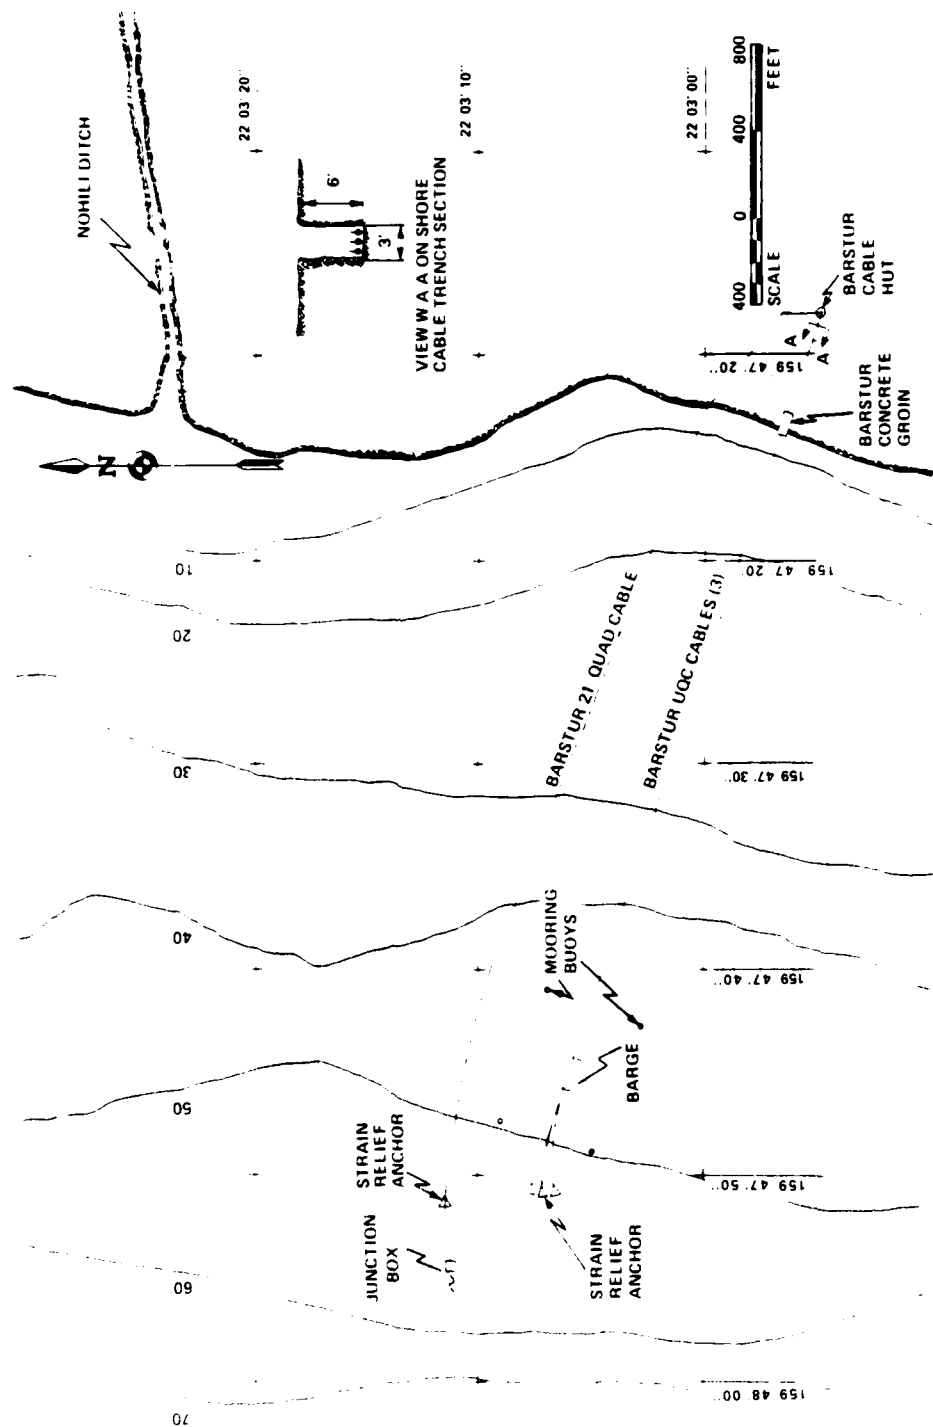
BARSTUR Cable Repair 4 Point Moor and Inshore Cable Layout
